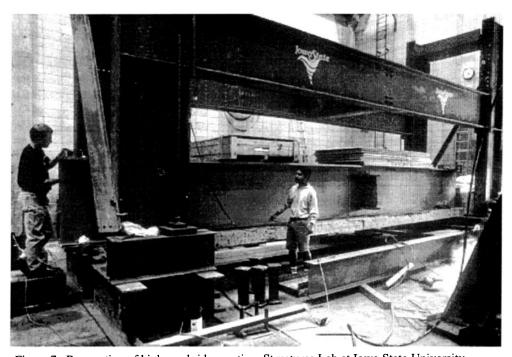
Preparation of highway bridge section, Structures Lab at Iowa State University
